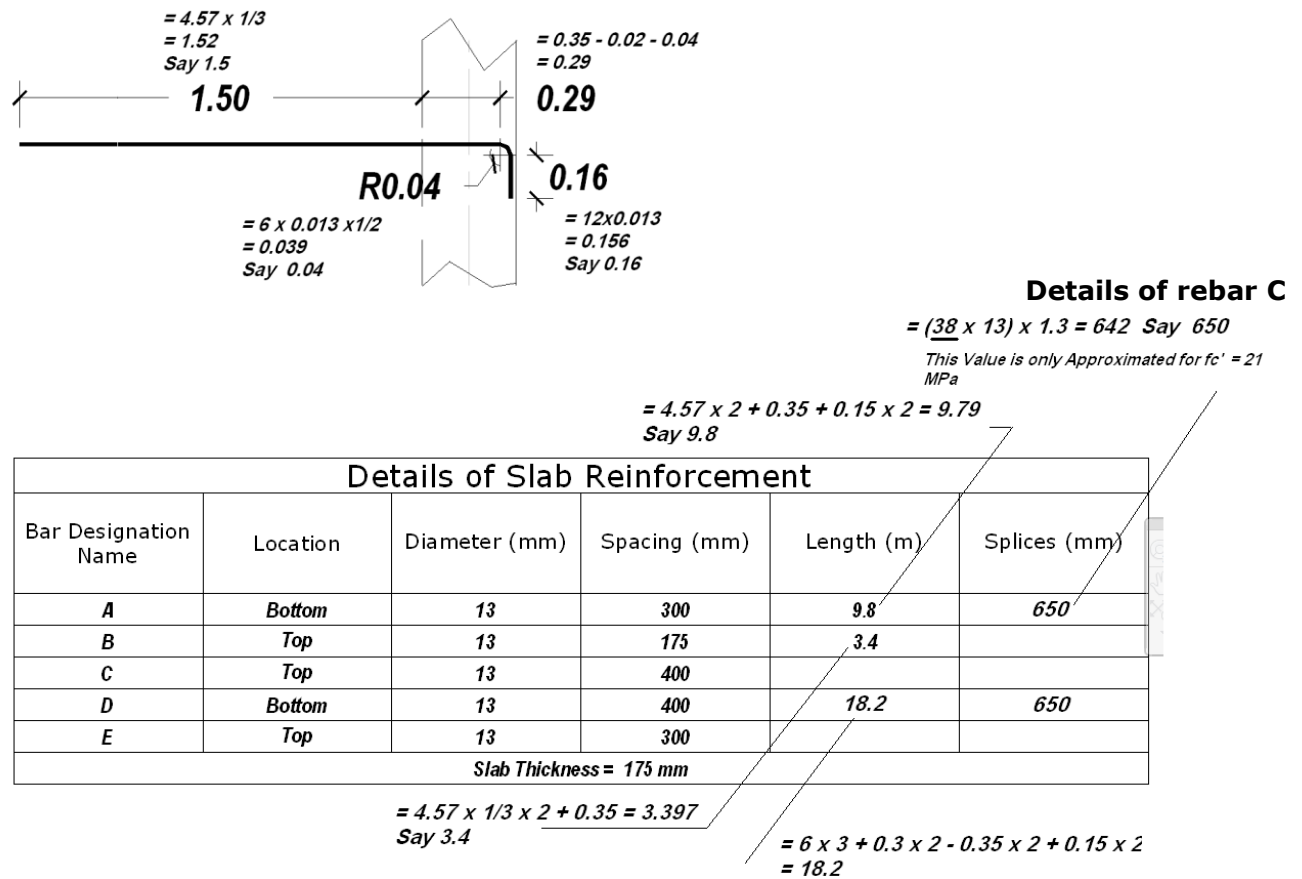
Slab reinforcement for Example 12.2-1.
